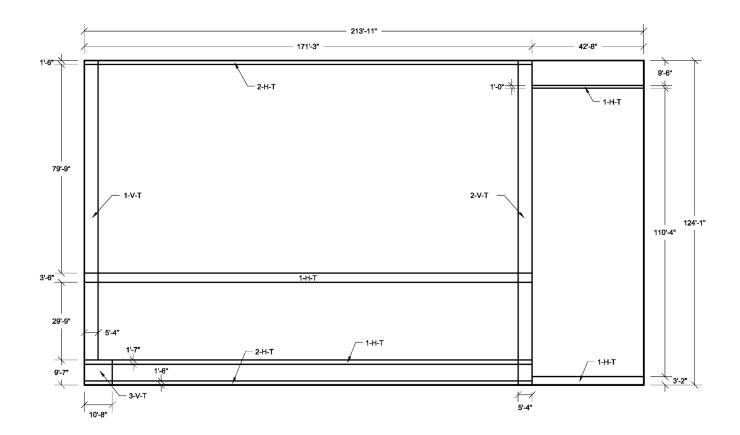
H.3-42 Elevation 95 Looking Down Transverse Reinforcement Zones
